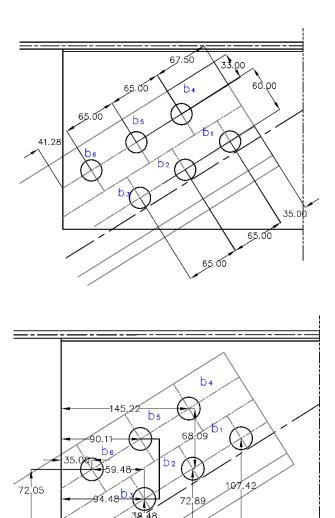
Positioning of bolts in diagonal 17 connecting to the gusset (dimensions in [mm])
